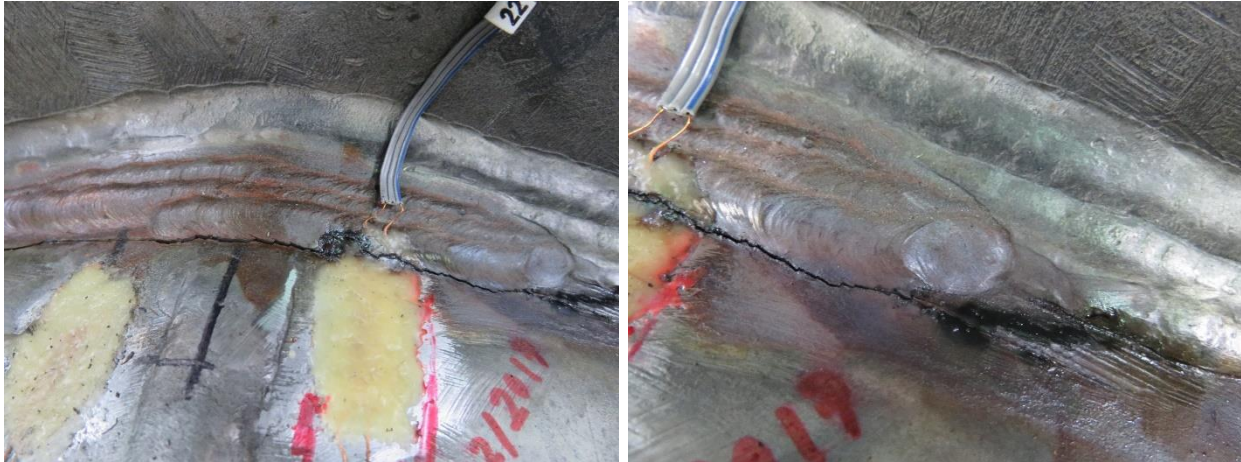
Weld-Repaired Specimen 33-3-12-TX-A3 – Bend 1 Following the Fatigue Test: Close-up View
